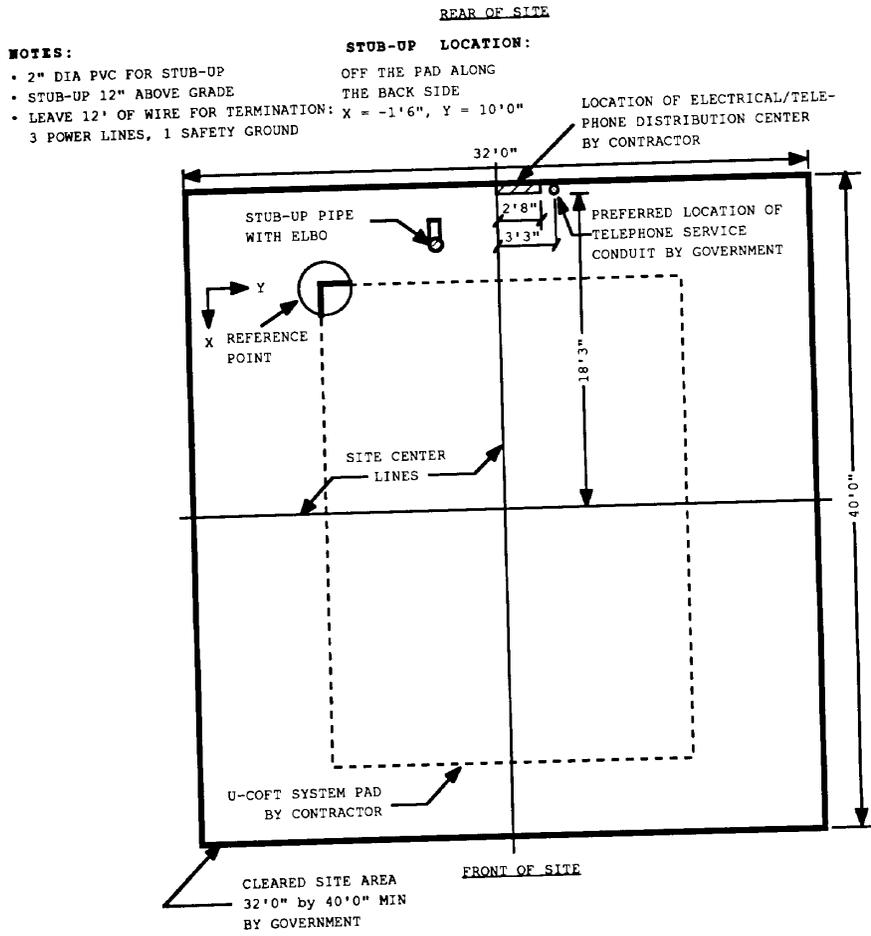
U-COFT 60-Hz Electrical Single Site Layout.
